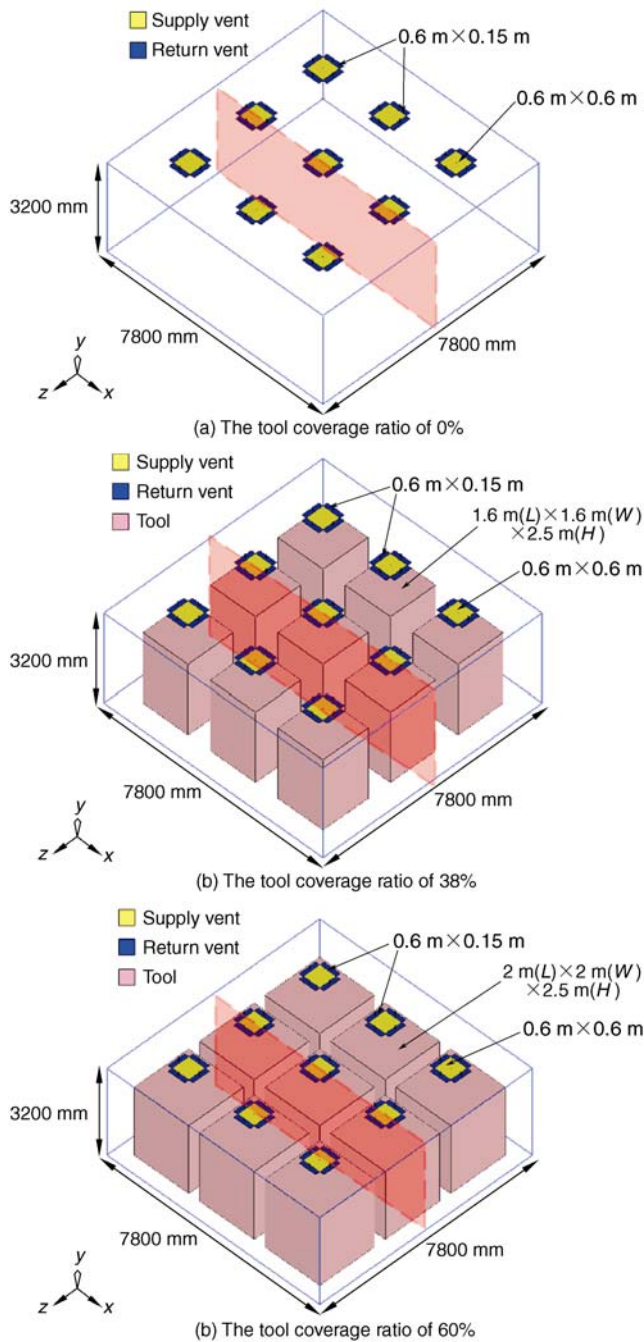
Model C: a four-way ceiling-return ventilation arrangement
